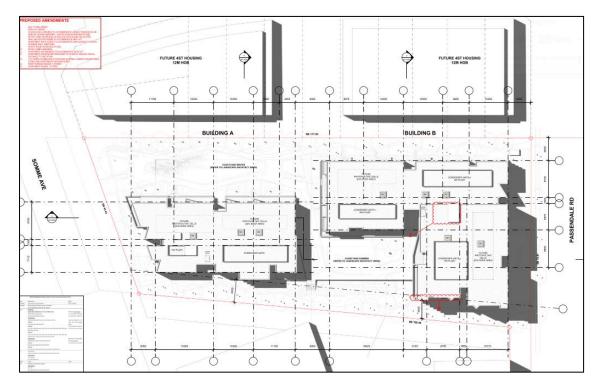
Building A & B Roof Plan (Source: Stanisic Architects)
